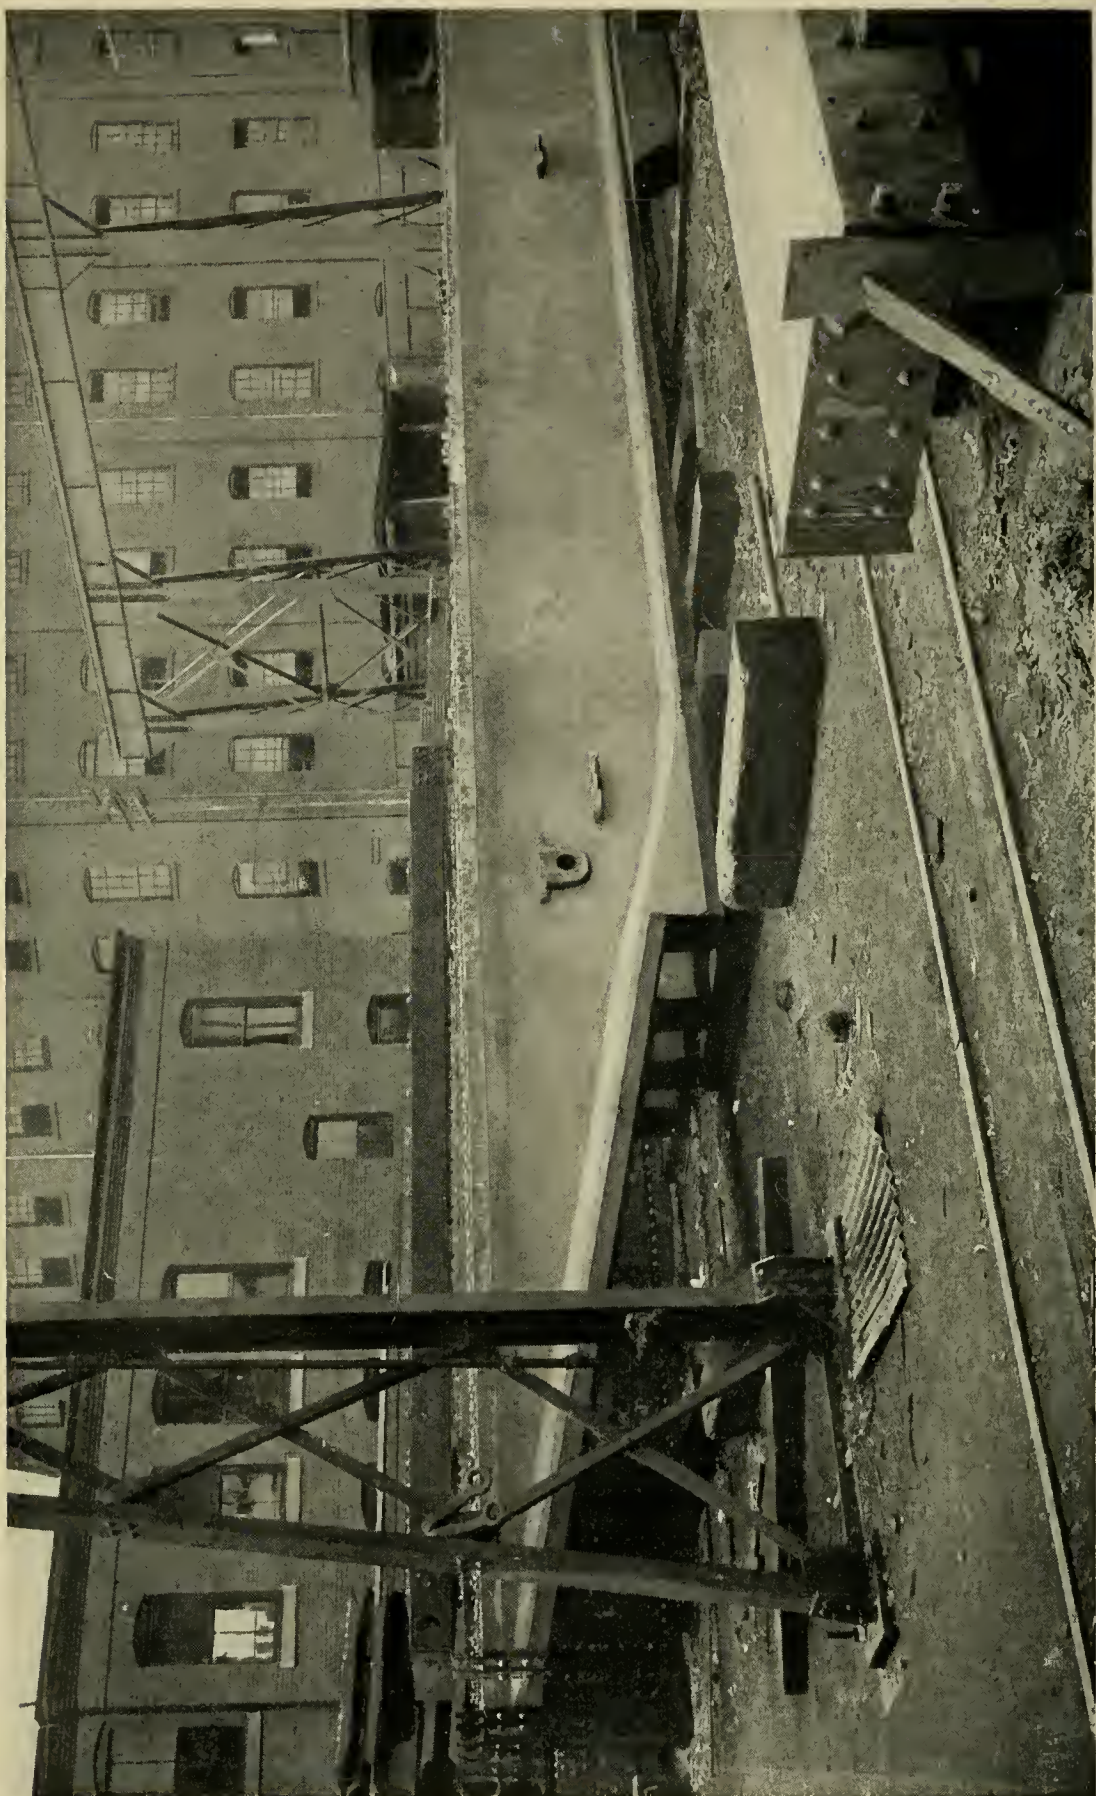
NEW CITY FLOOR BEAM WITH CONCRETE PROTECTION COMPLETED.
